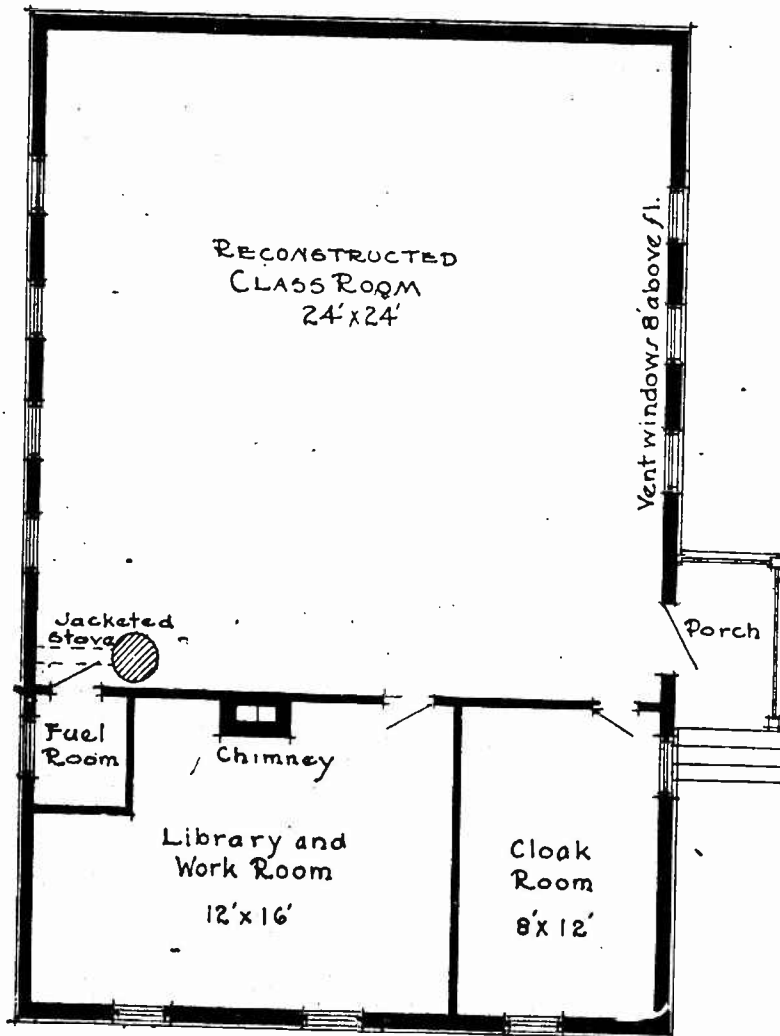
Reconstructed floor plan for an old building (based on fig. 14, p. 91).
